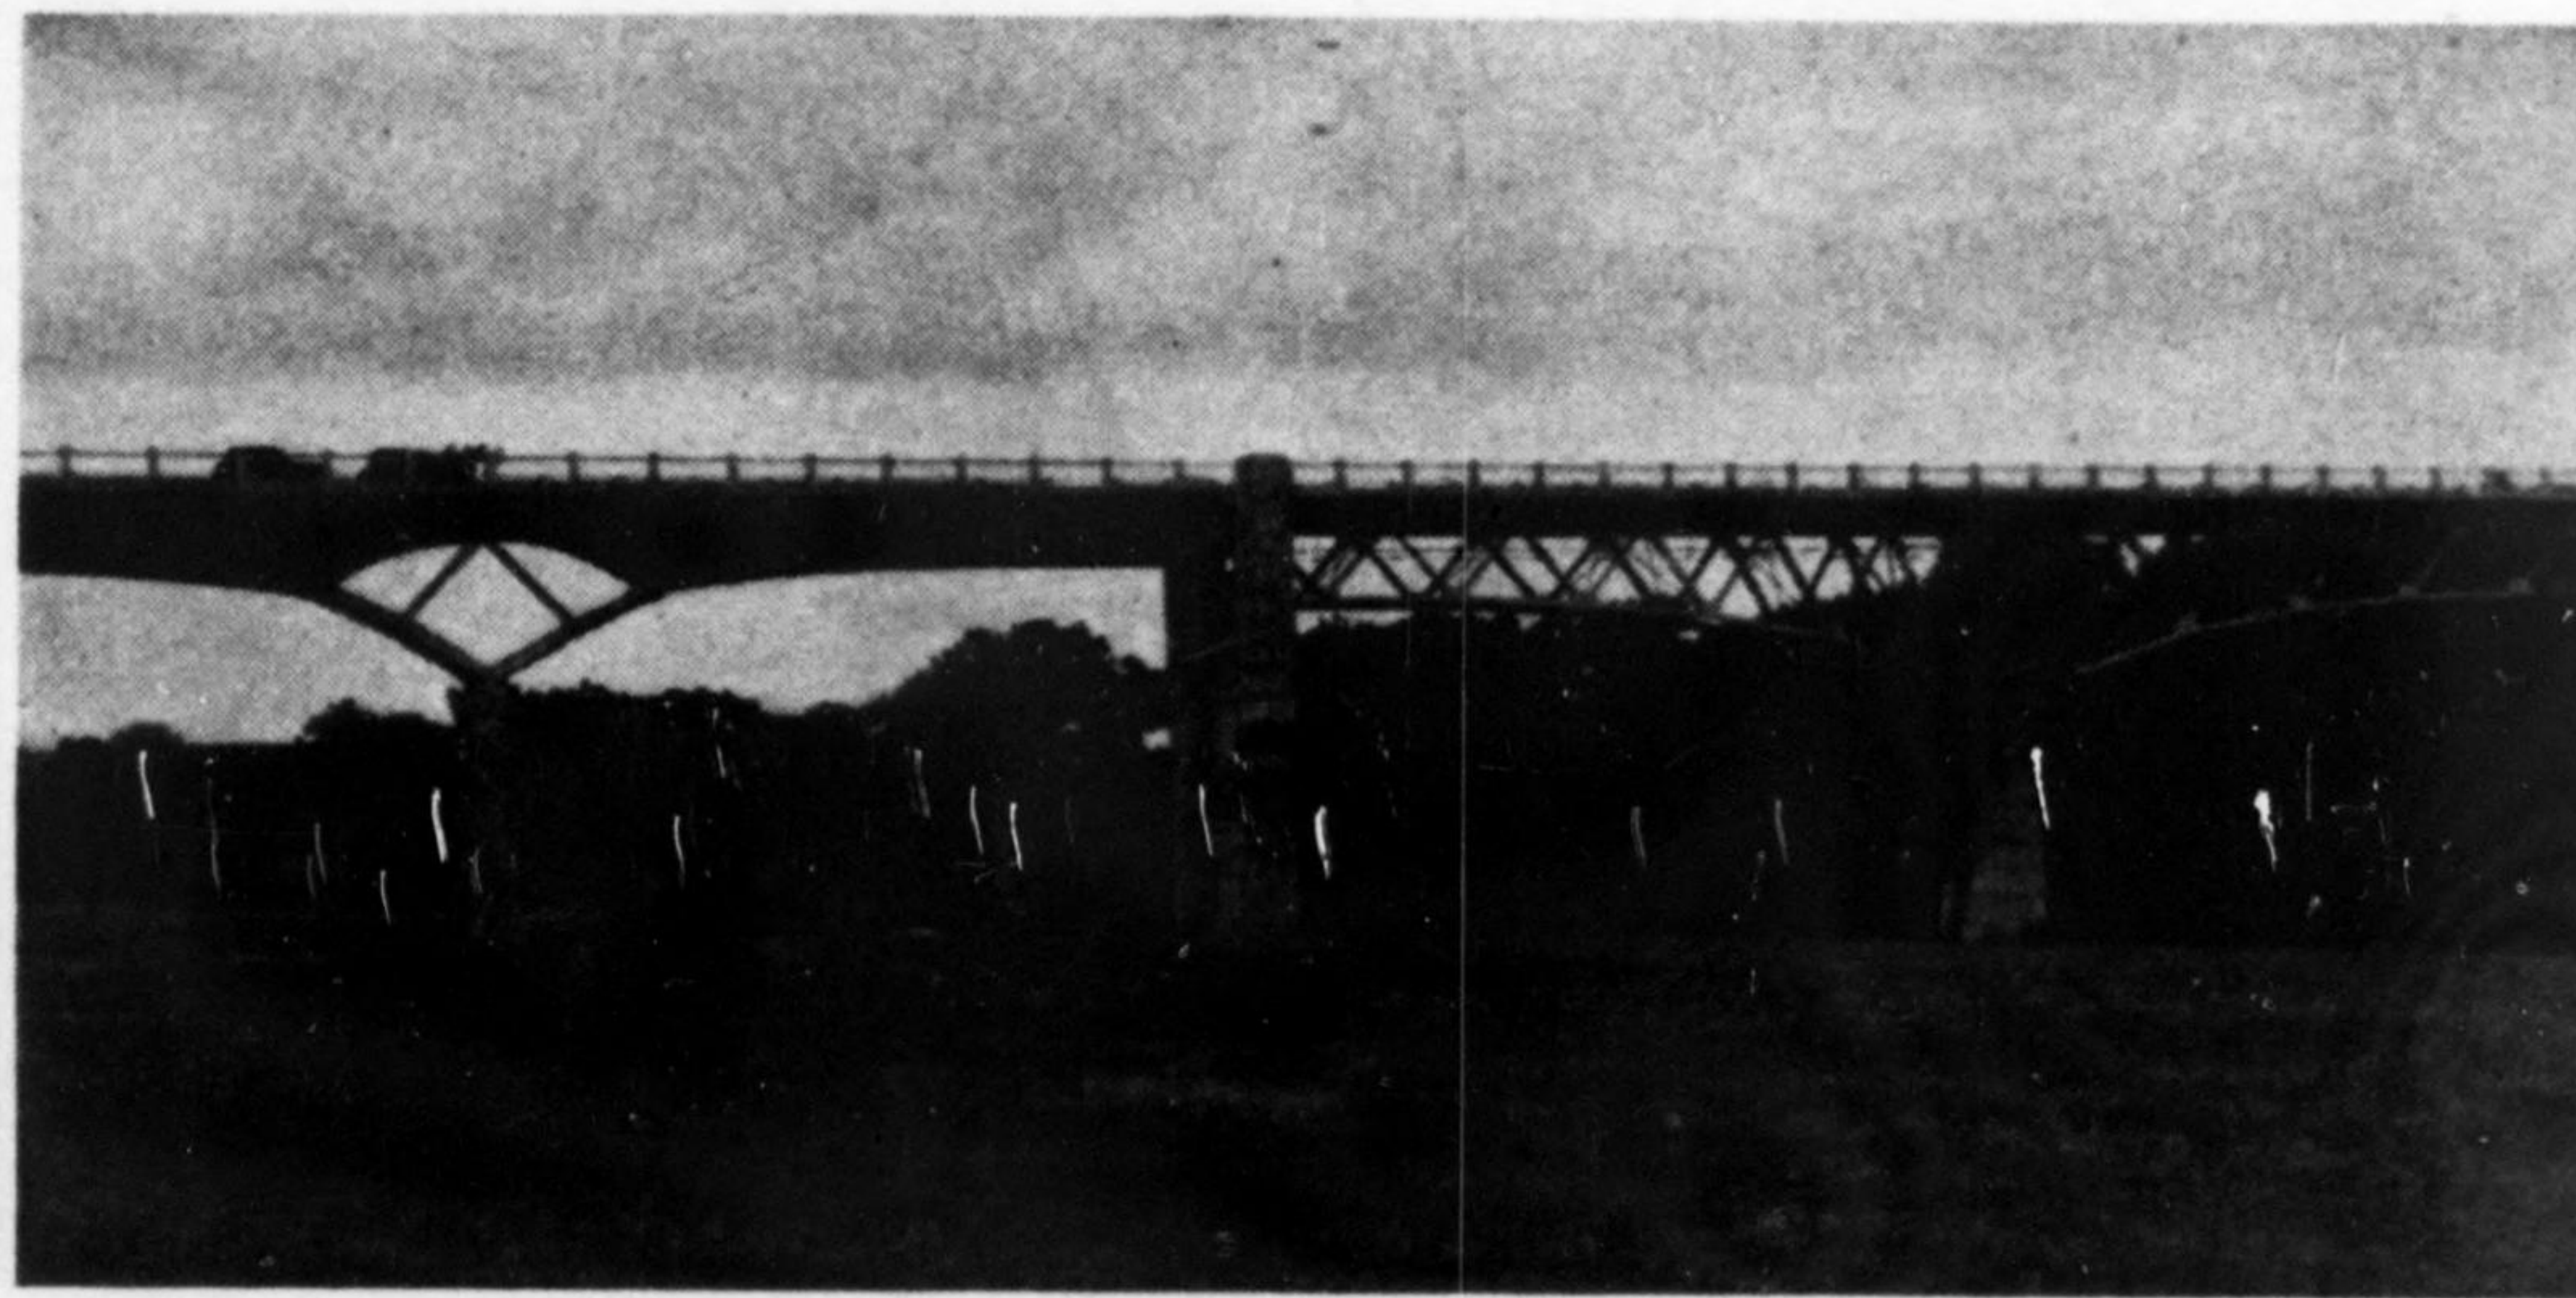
Modernistic piers provide an effective transition between girders and trusses.
